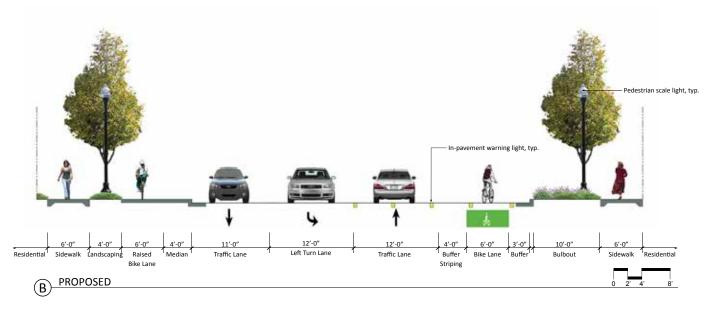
Section B: E. Duane Ave (looking west at enhanced intersection)
